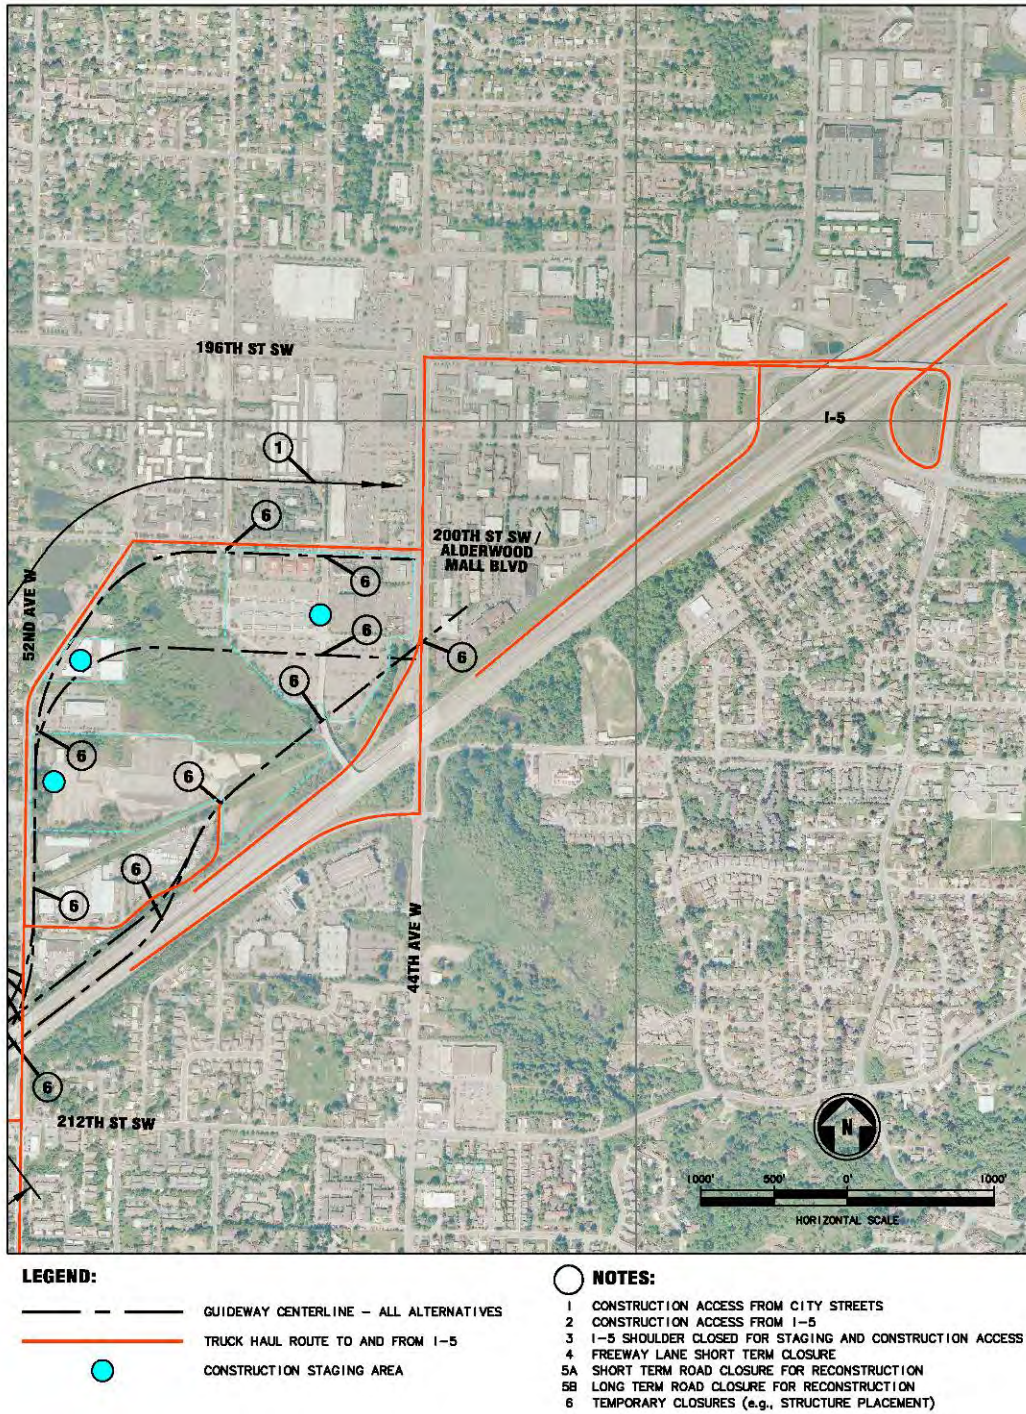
Potential Construction Staging Areas and Truck Routes – Segment C (212th Street SW to 196th Street SW)
